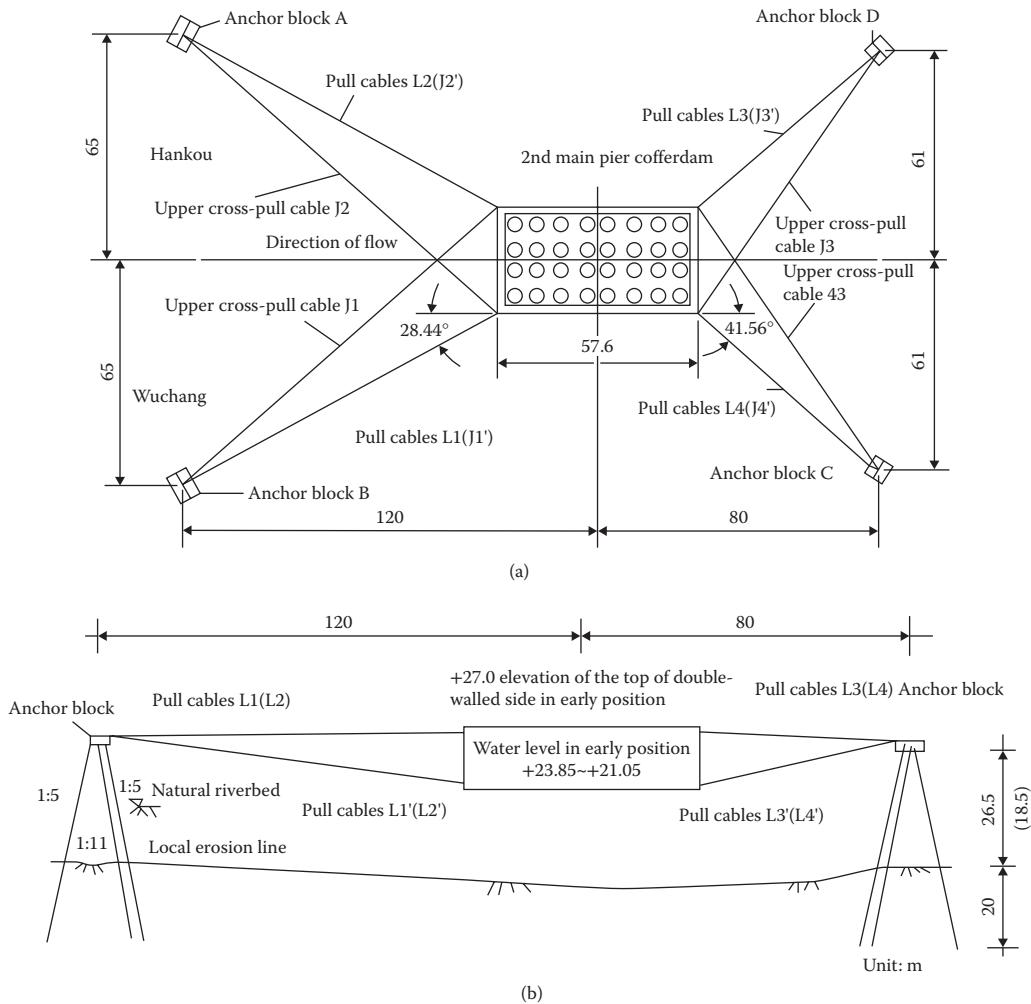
Positioning anchored pier. (a) Plan. (b) Side view. (From Li, J.T., & Qin, S.Q., *World Bridges*, 2, 17–19.)
